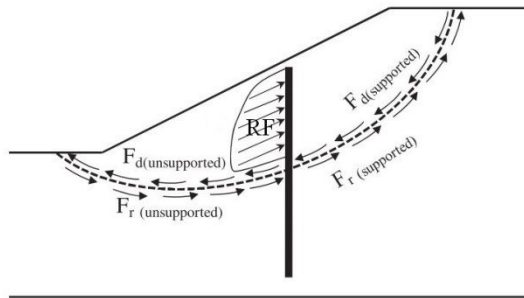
Forces acting on a pile-stabilised slope[71]
